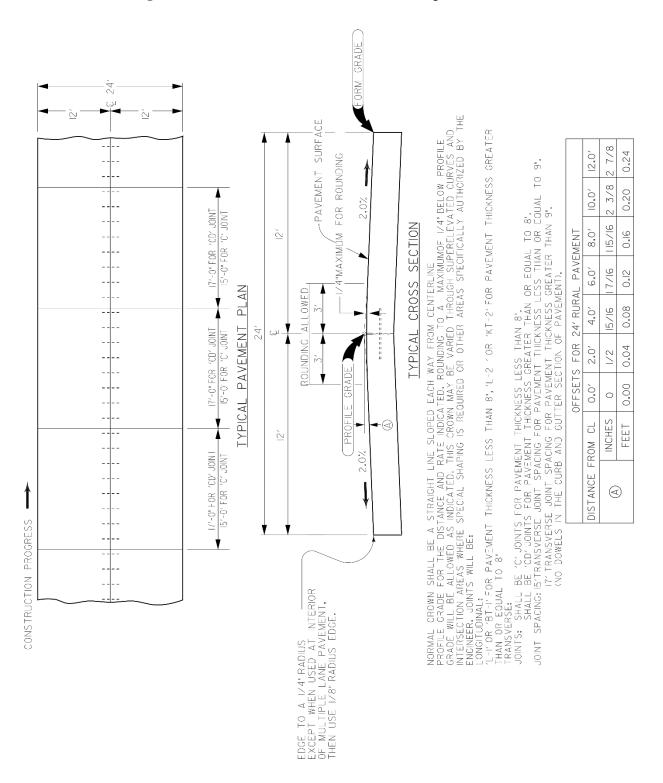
G-2.15: 24' Rural PCC Pavement Jointing and Crown Detail
